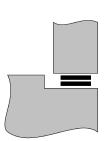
Manhole Ring to Reducing or Landing Slab
